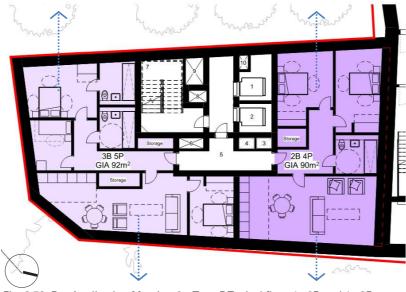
Pre-Application Meeting 6 - Type BTypical floor 1x 2B and 1x 3B proposal
